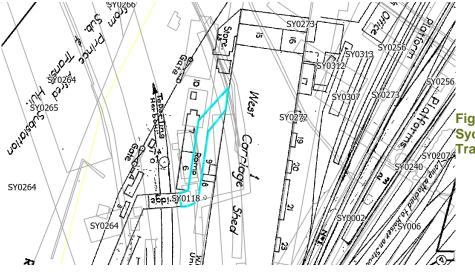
1953 lighting plan of Sydney Yard. Source: Sydney Trains Plan Room.
